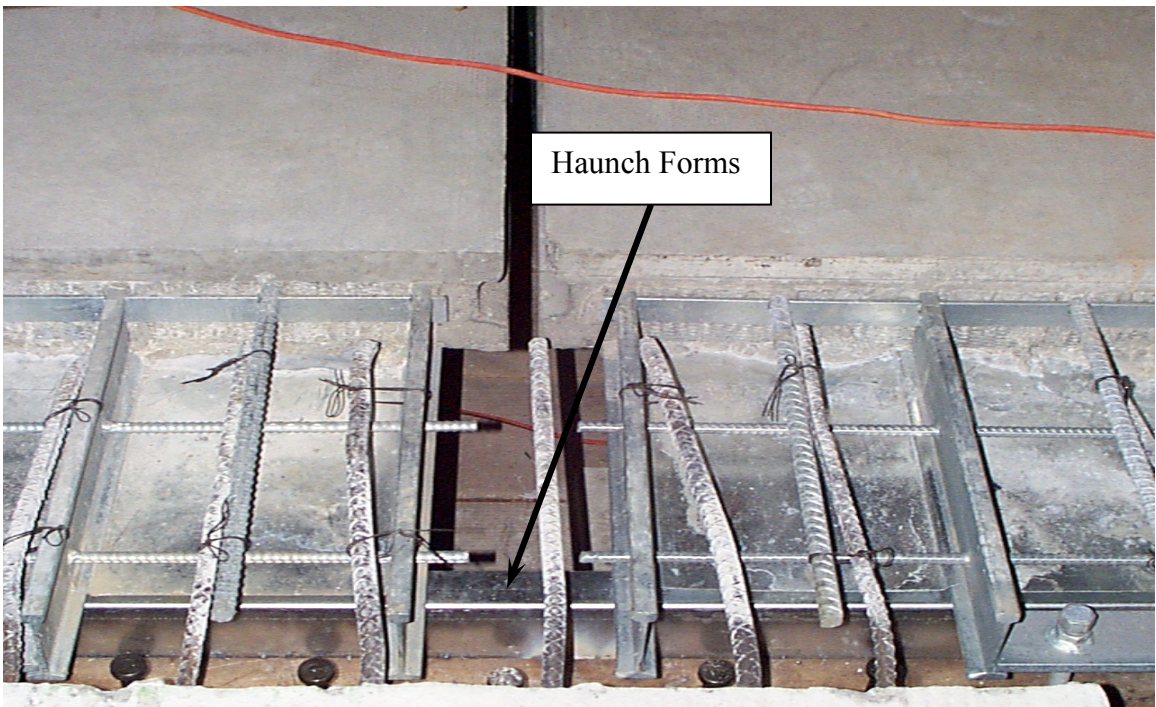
Haunch Forms at the New Deck Panel – Existing Slab Interface
